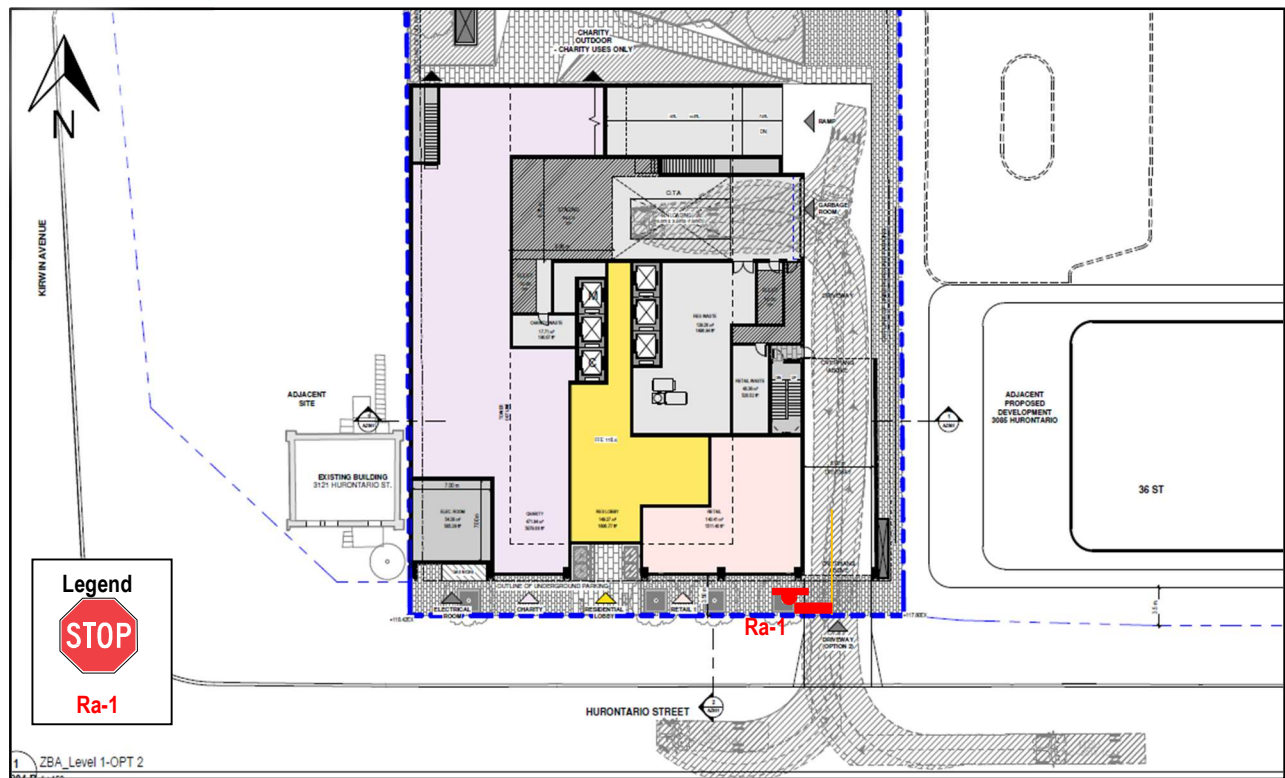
B – Proposed Pavement Marking and Signage Plan for Access Option 2
